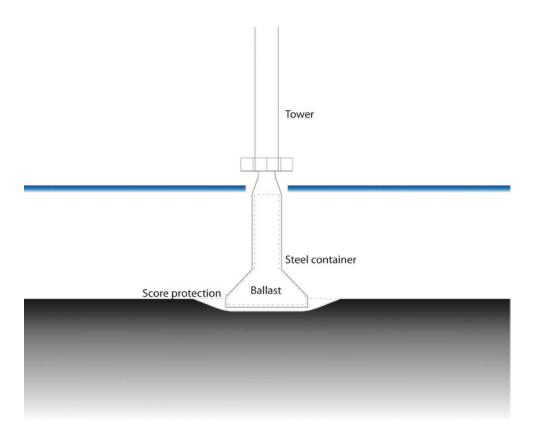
A schematic outline of a steel gravity foundation. The scale is not proportional; for details and dimensions see section 2.1.4.
